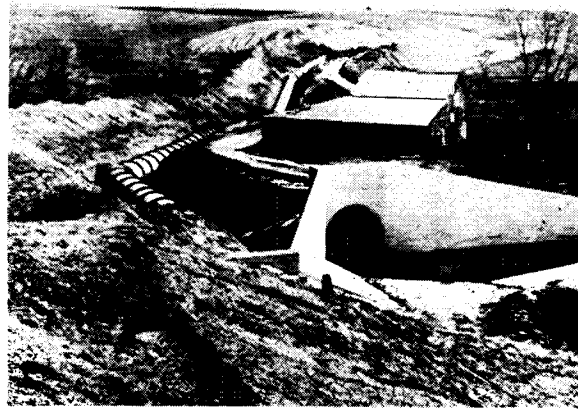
Inverted siphon inlet transition and 60-inch-diameter precast concrete pipe. P 499-700-520.
